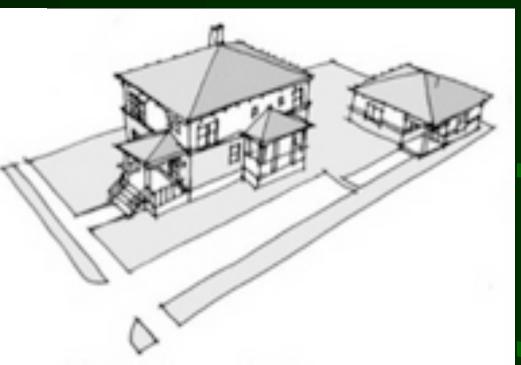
Accessory Building Placement Accessory buildings may be located in shaded areas.
